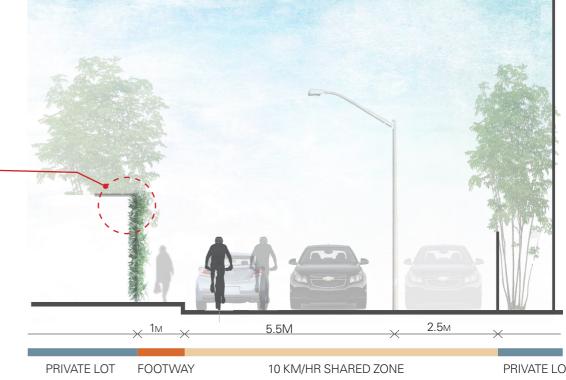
Indicative street section for Manhoney Lane upgrade Note: Street parking will be removed in the narrow section of the road
